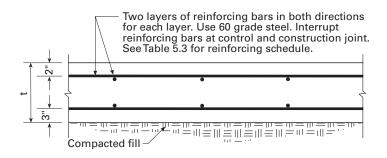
Concrete detail for secondary containment floor with two layers of reinforcing. (See table 5.2 for concrete thickness, t).
